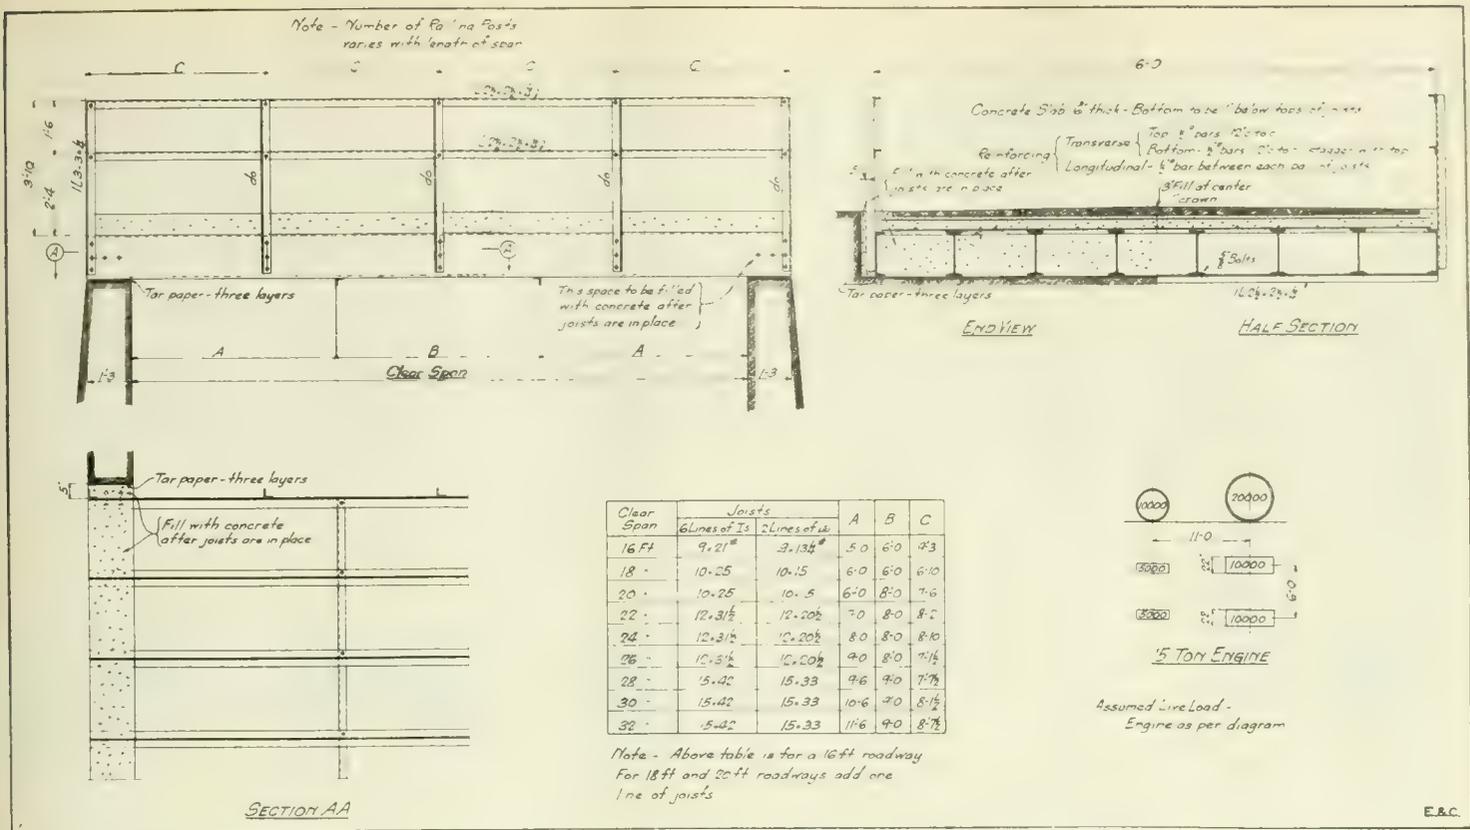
Standard I-Beam Bridges With Reinforced Concrete Floors of the Iowa State Highway Commission.
